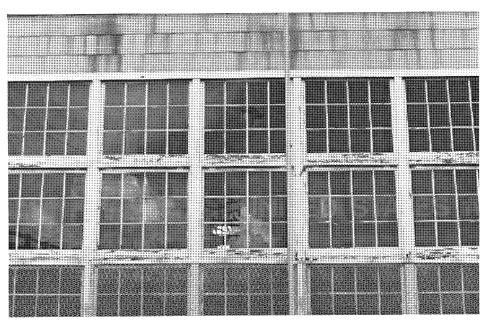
Building 991 exhibits broken window panes, discolored siding, and peeling paint on the trim.
